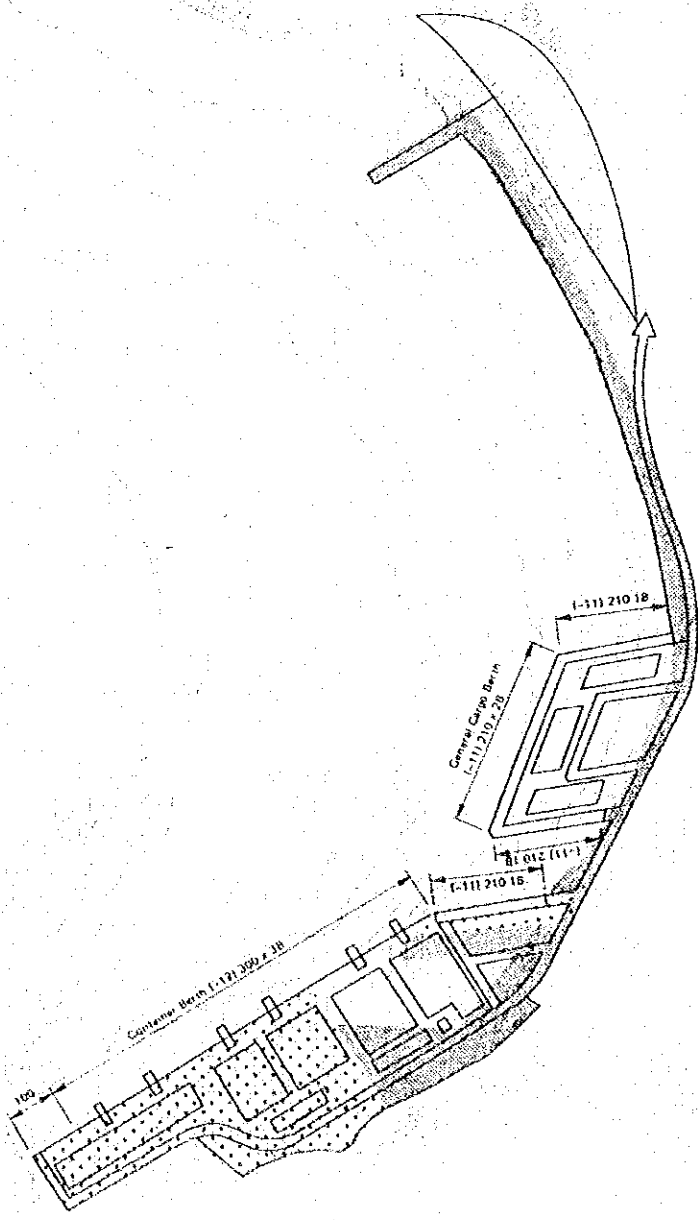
Phase Plan for Constructing Berths of the Master Plan of the Port of Valparaiso
